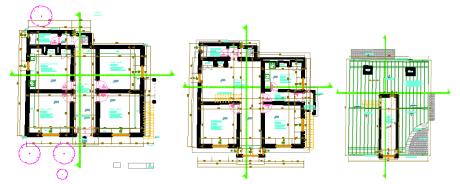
Halim Düzgün House's restoration ground floor plan, first floor plan and roof plan
